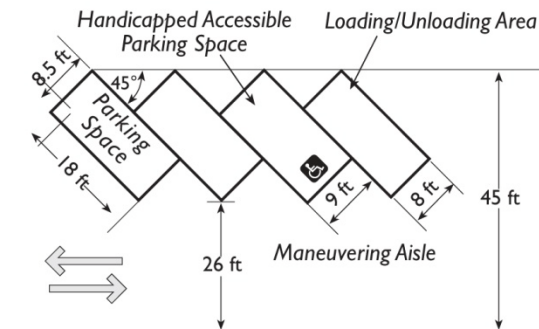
C: PARKING AREA DESIGN: 45° PARKING SPACE
